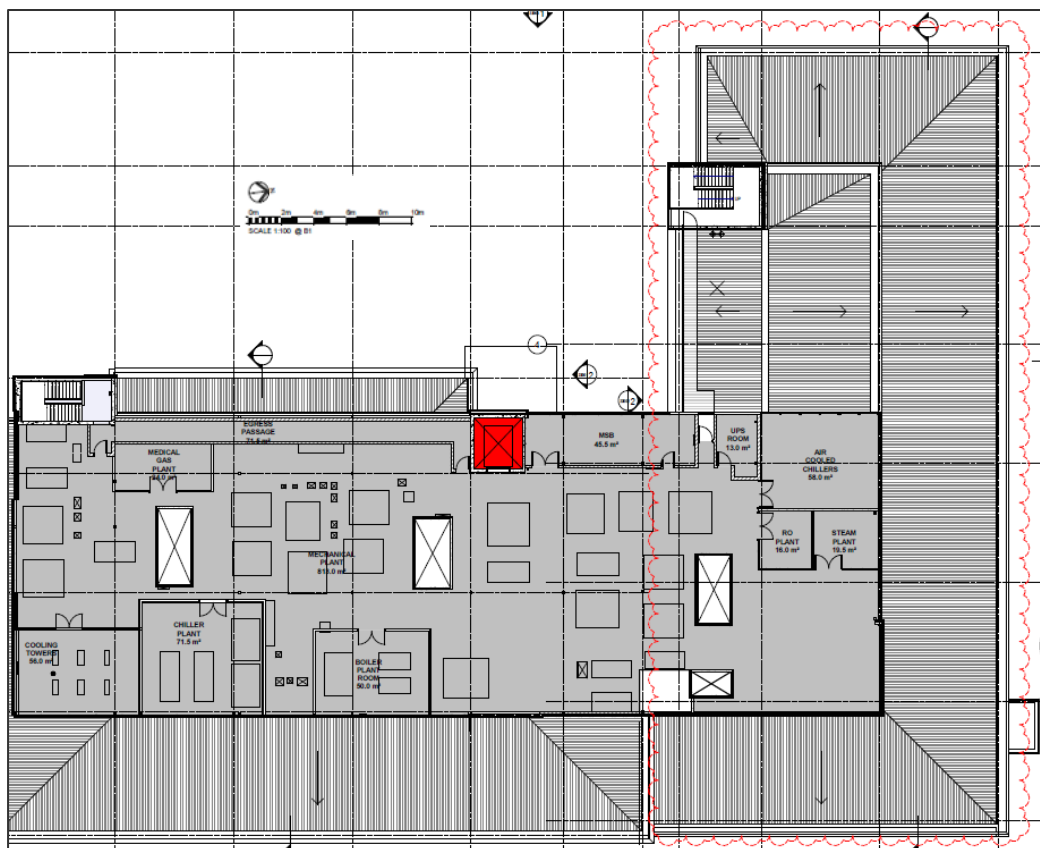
| Approved Level 2 Plan (SSD 8980)
